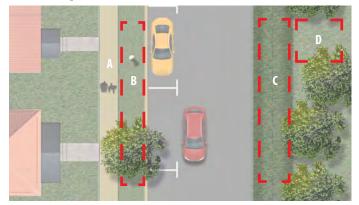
Snow removal along streets and parks: (A) Sidewalks are kept clear; Designated storage areas within (B) planting strips, (C) swales and (D) parks
